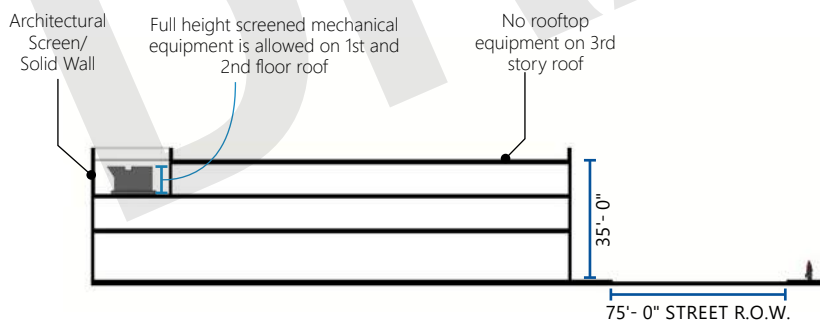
Rooftop equipment setback for development in the Lake Street District.
